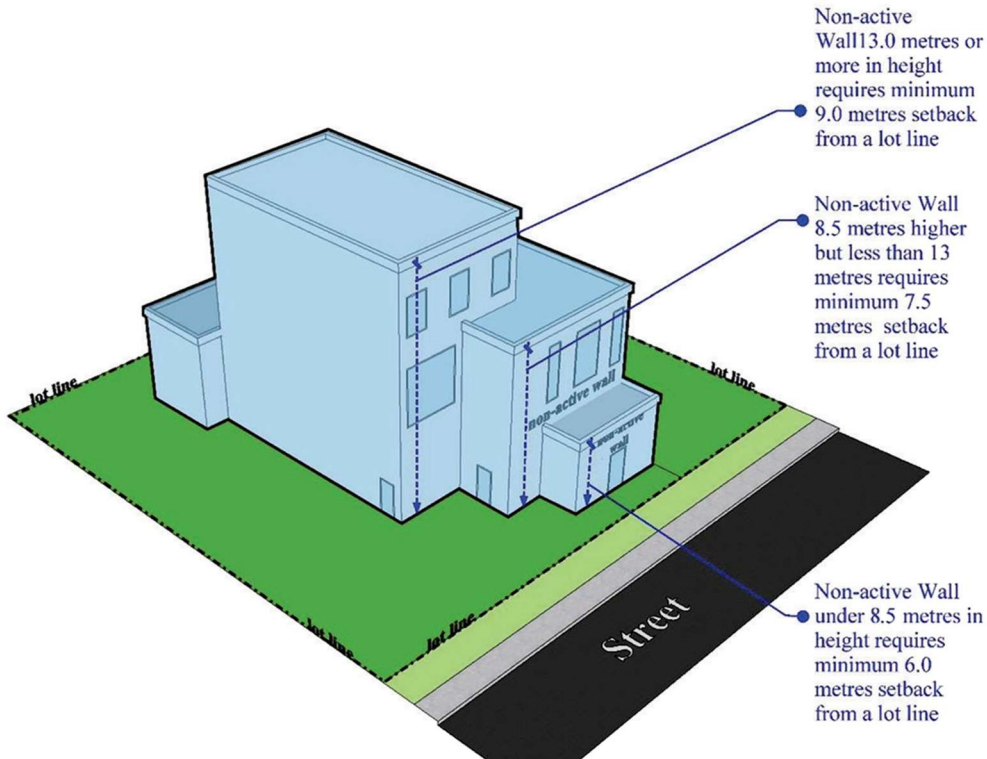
C.F3: Mixed Large Market Zone Non-Active Wall
